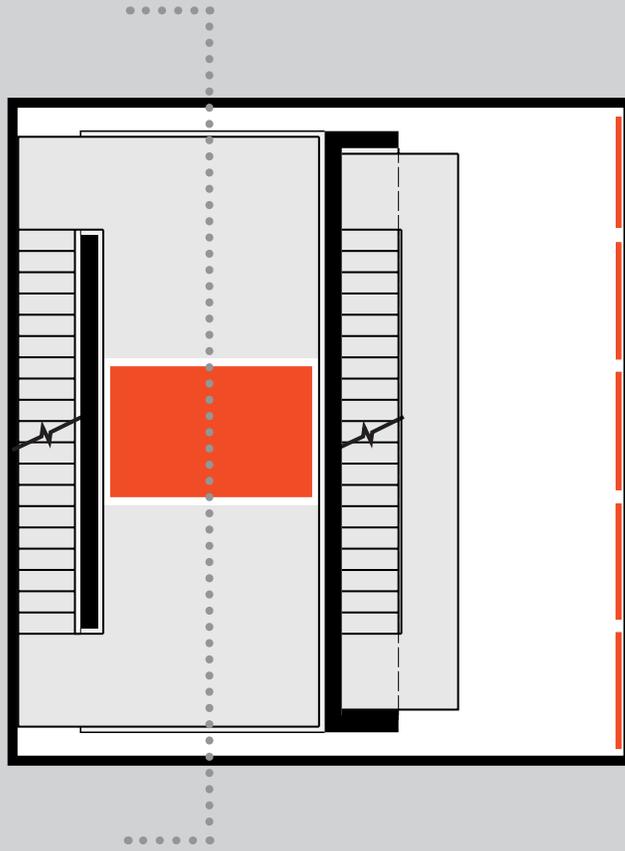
Floor plan of SYSTEMATIC COLLAPSE installation space.
